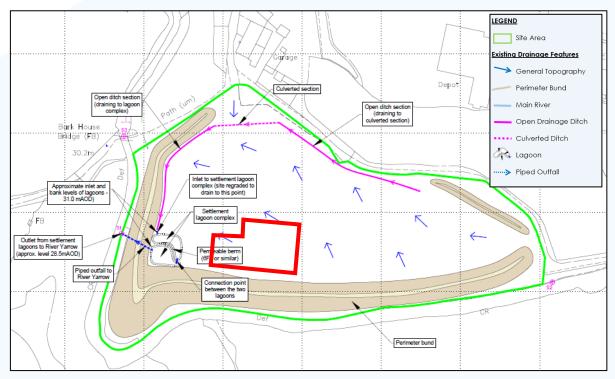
Existing Drainage Plan Extract (Oaktree Environmental Ltd, 2020)
